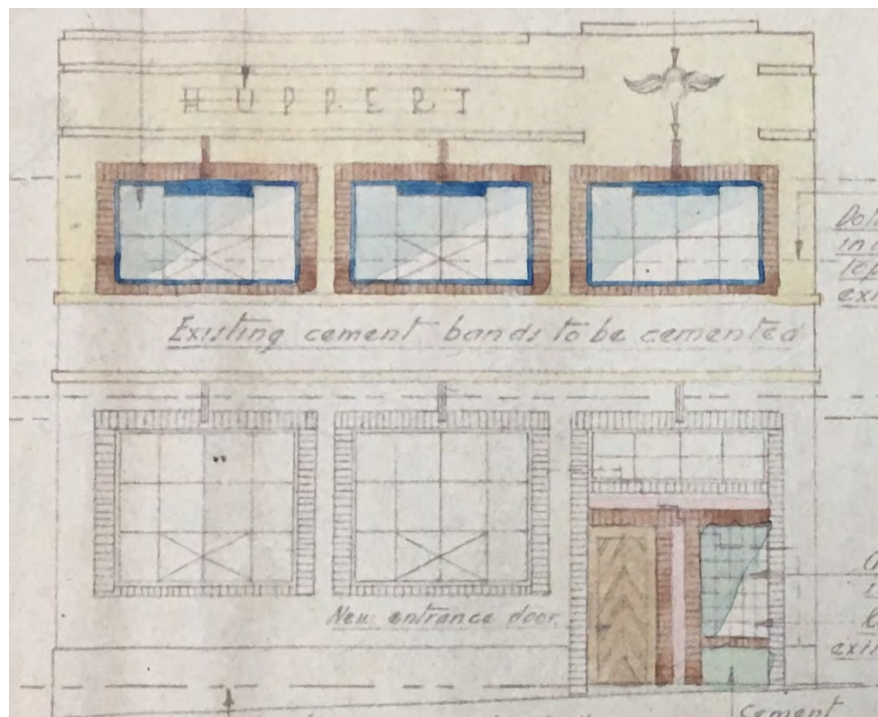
1937 permit drawing showing first floor additions to the Bouverie Street façade. Source: Public Records Office Victoria.
